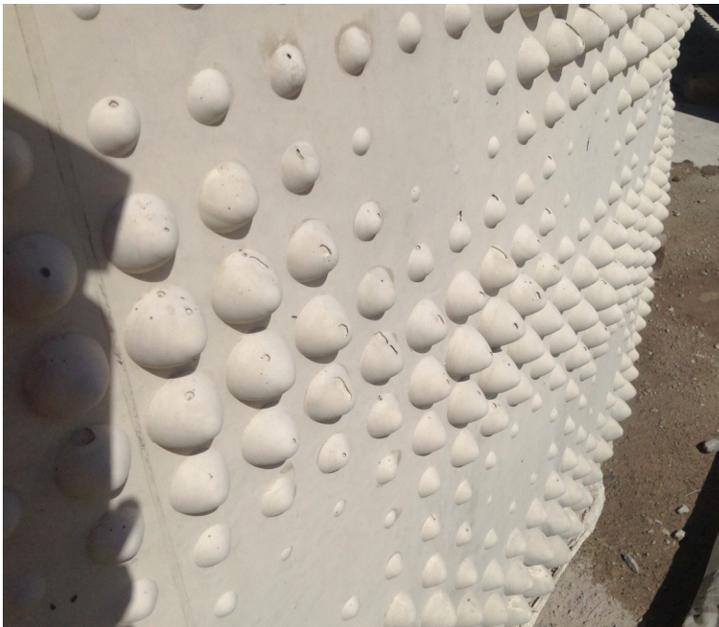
Surface Damage to be Repaired to Architectural Fascia Panel in Fabrication Yard
